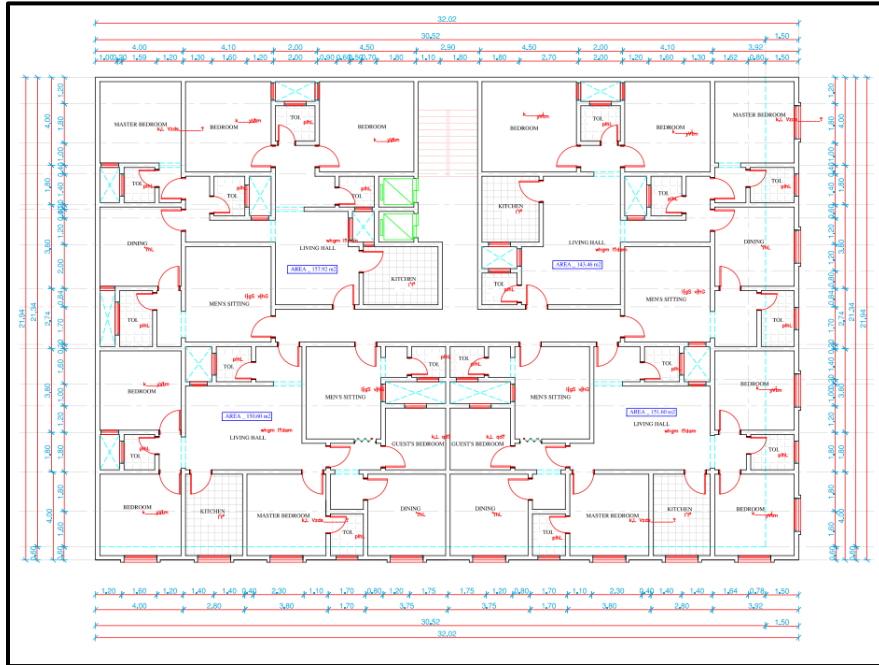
Plan of the apartments located in the first to the fourth floors.
